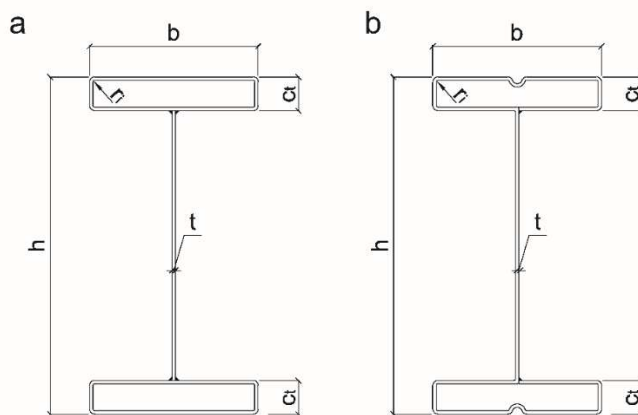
Geometry of: (a) tested section and (b) optimised section.
